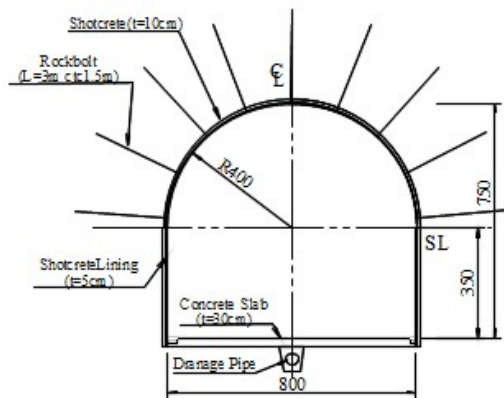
Cross sectional drawing of access tunnel to Main Linac
